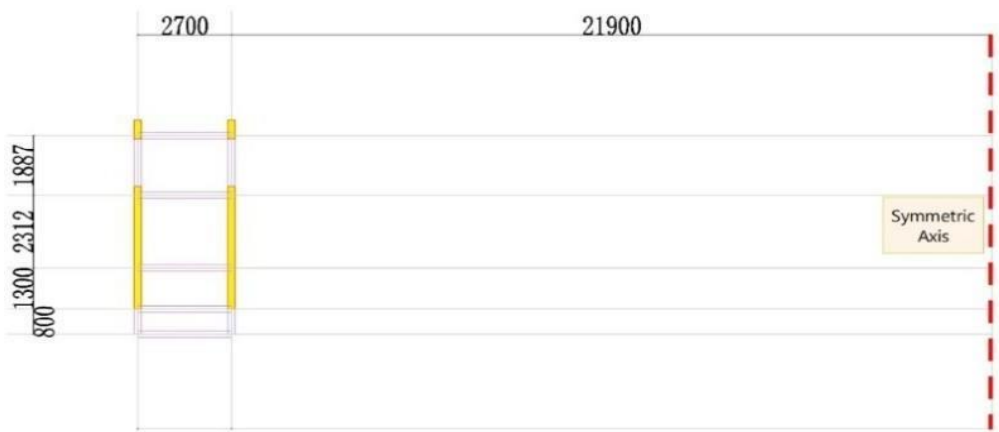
Half plan view of the towers for Model 1 (level 15) [26]
